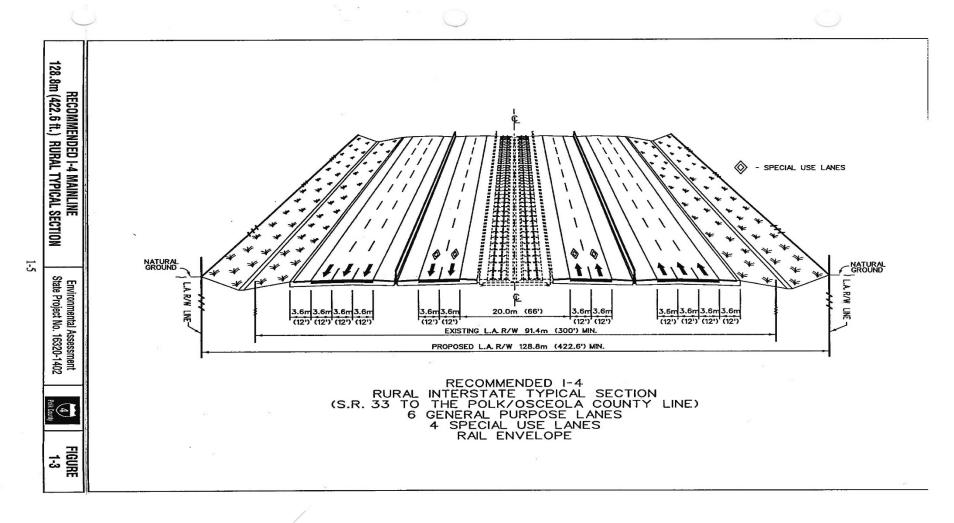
SR 400 (I-4) Typical Section from 1998 EA / FONSI
